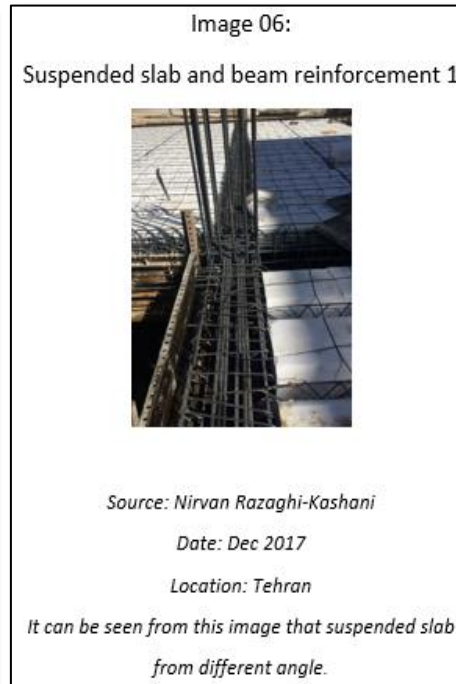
Images of suspended floor slab ready for concrete in Tehran, (source: Nirvan Razaghi-Kashani).
